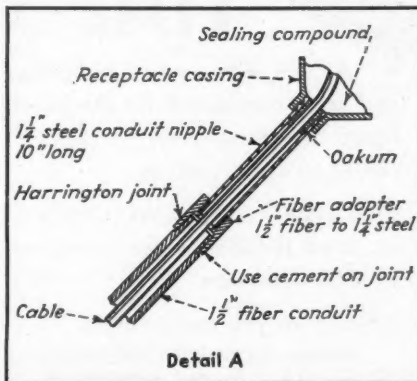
Moisture seal at receptacle housing and fibre-to-steel connections underground shown in detail.
